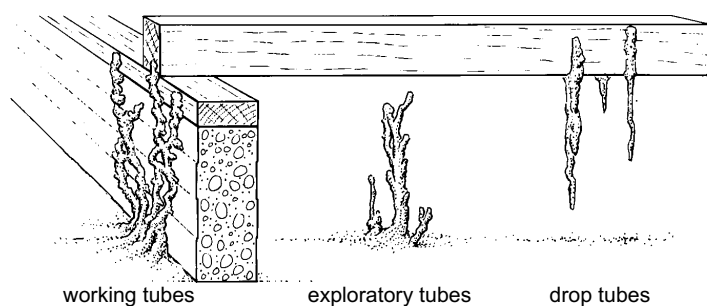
Subterranean termites construct three types of tubes or tunnels. Working tubes (left) are constructed from nests in the soil to wooden structures; they may travel up concrete or stone foundations. Exploratory and migratory tubes (center) arise from the soil but do not connect to wood structures. Drop tubes (right) extend from wooden structures back to the soil.
